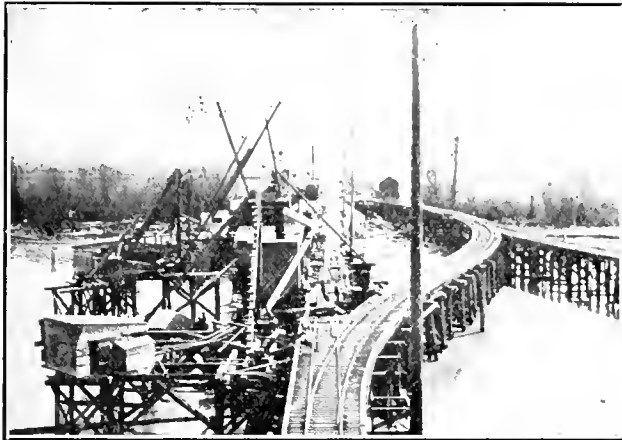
C.P.R. Pitt River Bridge, Showing Trestle and Work on Eastern Portion.
